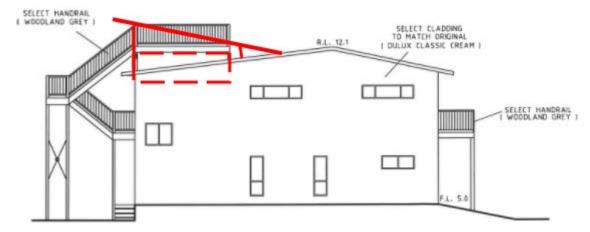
Possible example of integrating the deck into the overall building (stairs should also be less visually dominate and integrated to the building form)
